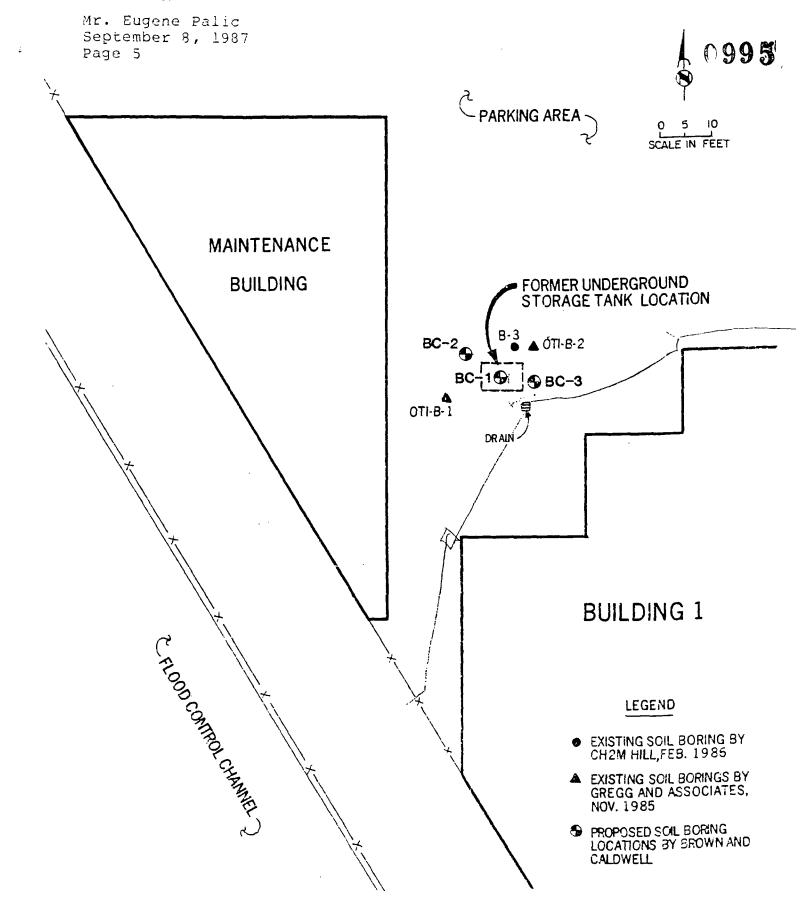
Underground Storage Tank Location and Proposed Soil Boring Locations
